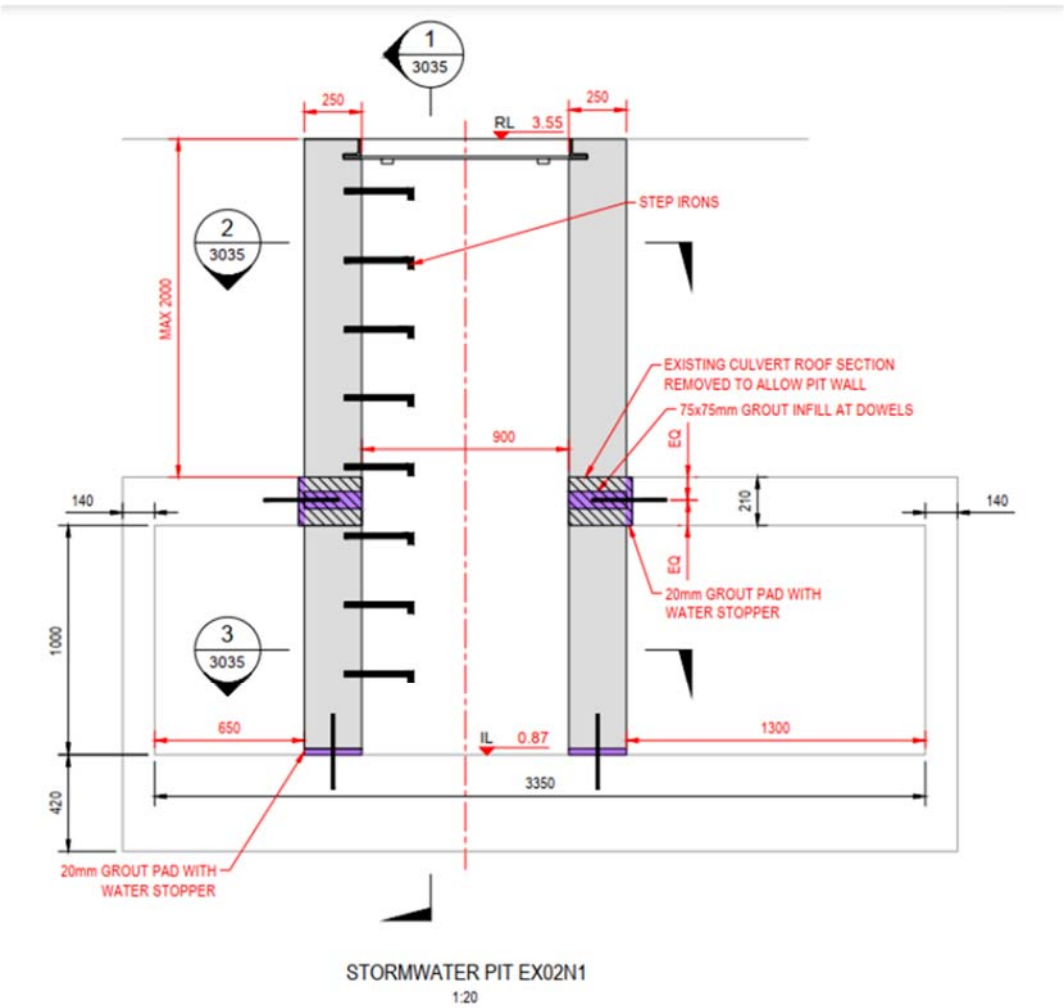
| Proposed Culvert Riser Pit Type 1 of 2 (Source: Drainage Design Report)
